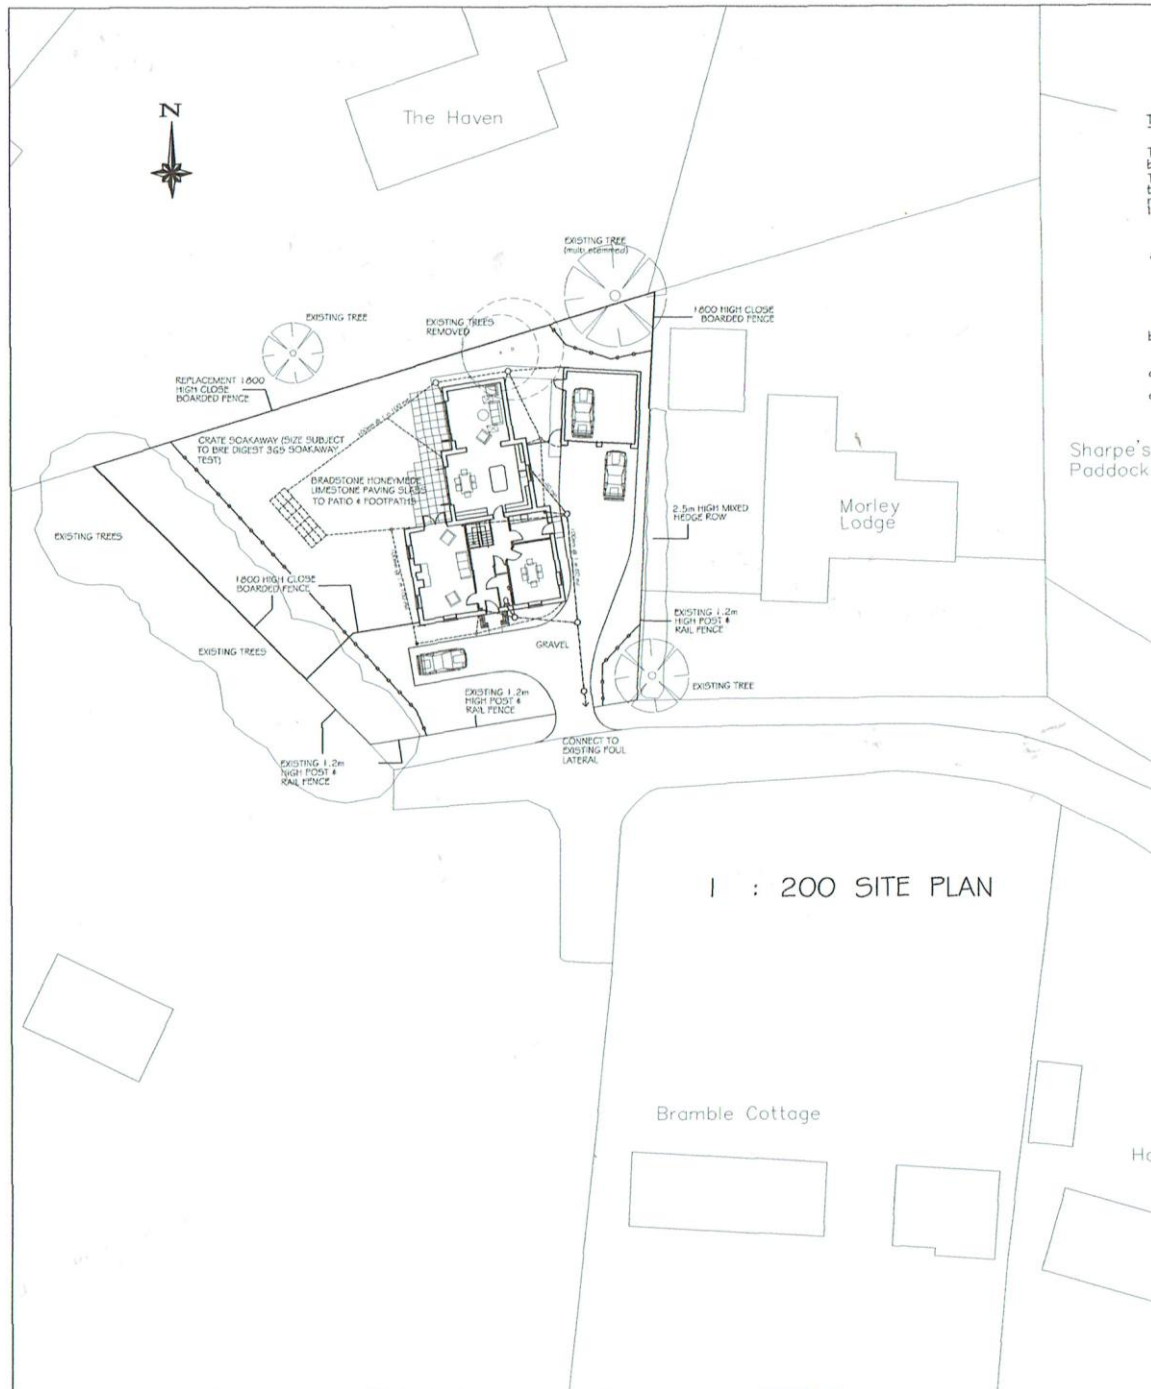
Block plan showing the proposed layout of the development site at an original scale of 1:200, (not to scale), (extract from Architects plan).
